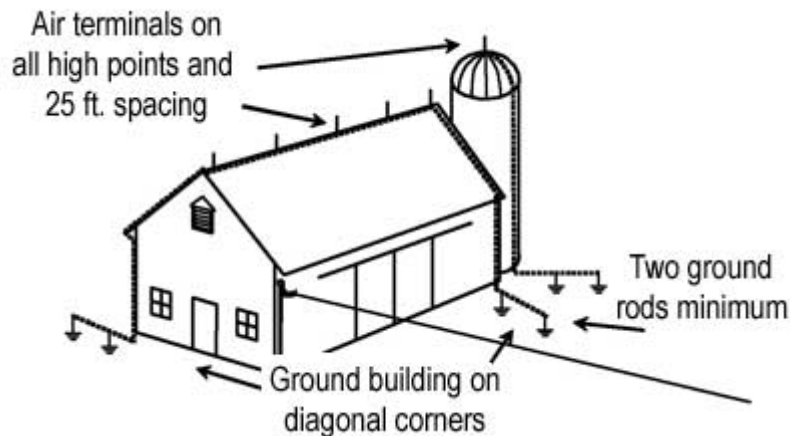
Attach air terminals to the roof ridge and other high points and connect them to grounding electrodes on opposite corners of the building with a main connecting wire.
